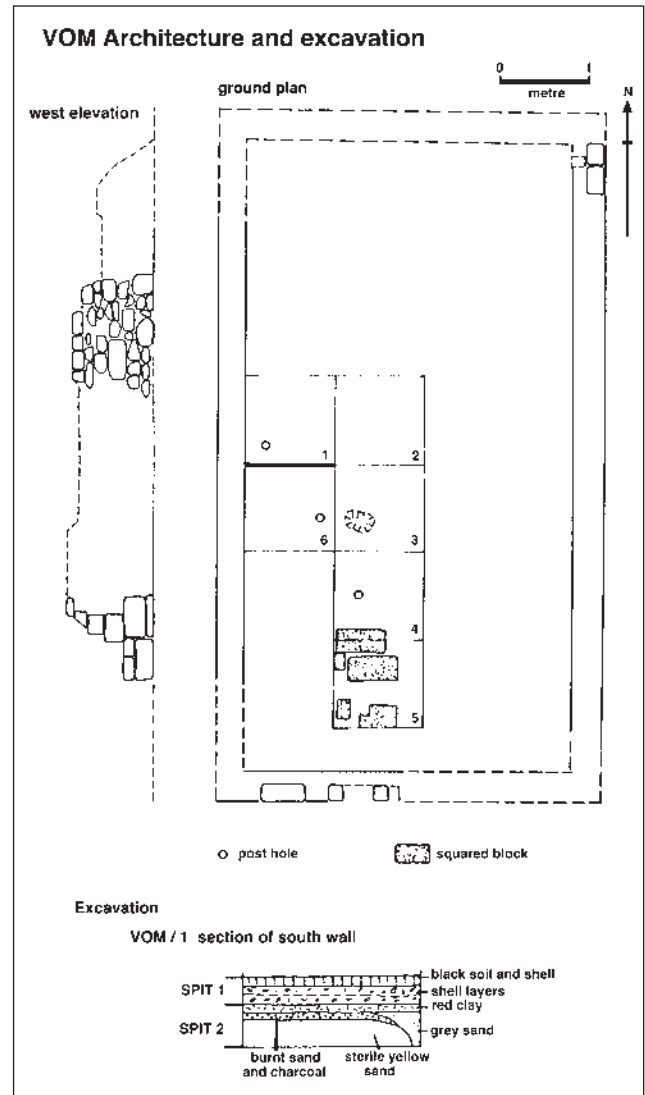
Officers' Mess: ground plan, elevation of standing western wall, plan of excavation squares and stratigraphic section.
